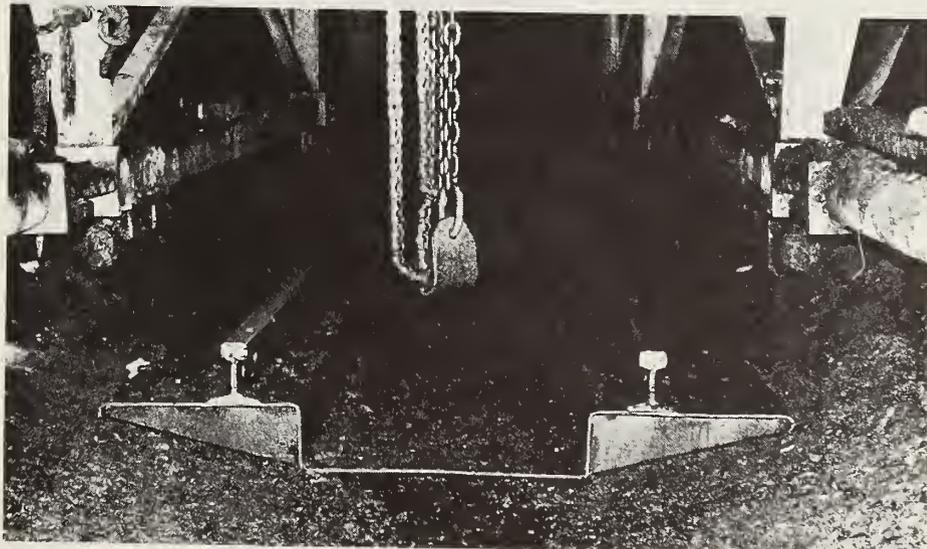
Tracks Consisting of a Steel Box Serving as Tunnel Drainage Trench with Welded-On Rails
